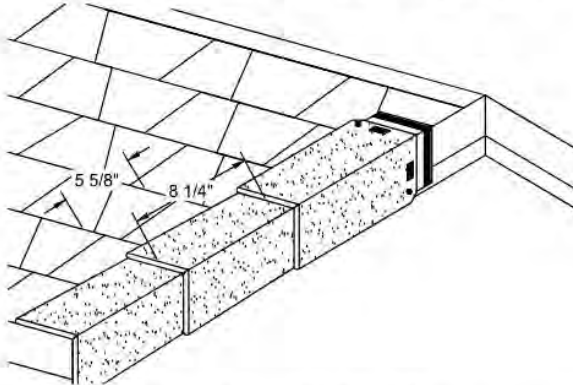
Installation of EZ-Ridge™ Shingles on Rake Edges of the Roof
